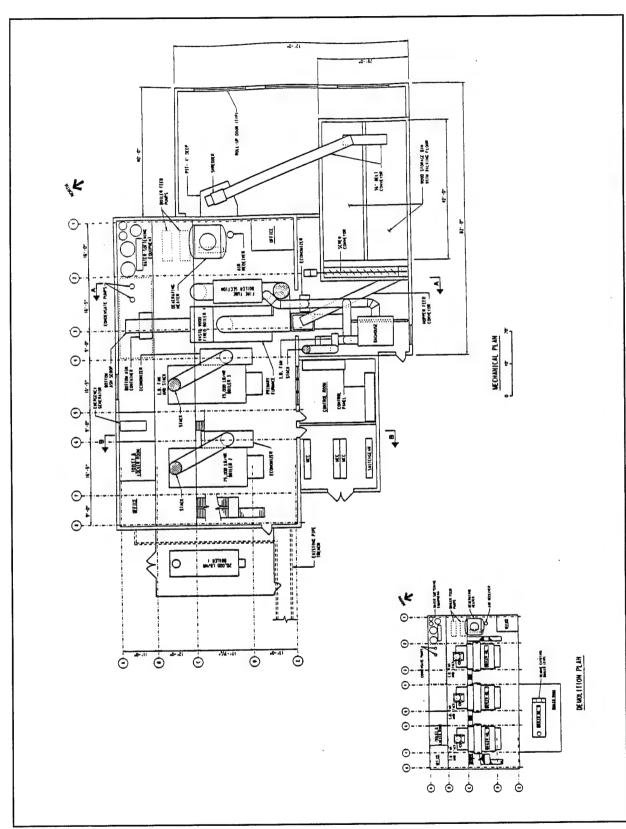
Demolition Plan and Alternate 4: New gas/oil boilers and waste wood boiler.
